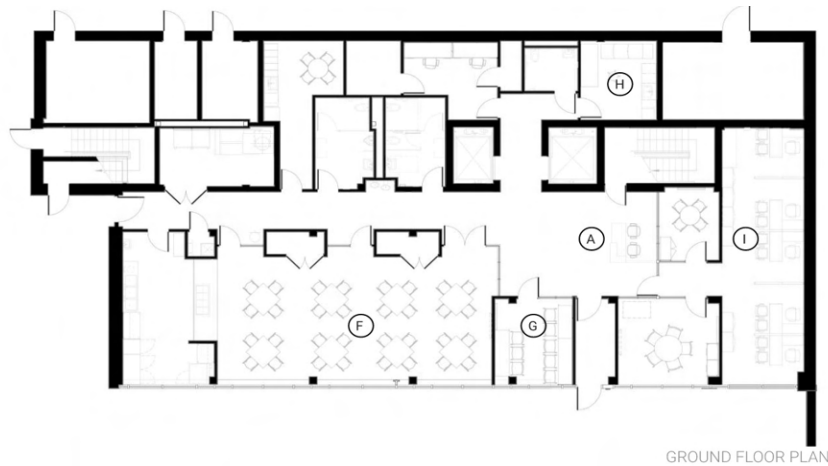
Final ground floor plan; Source: CS-A final presentation document
